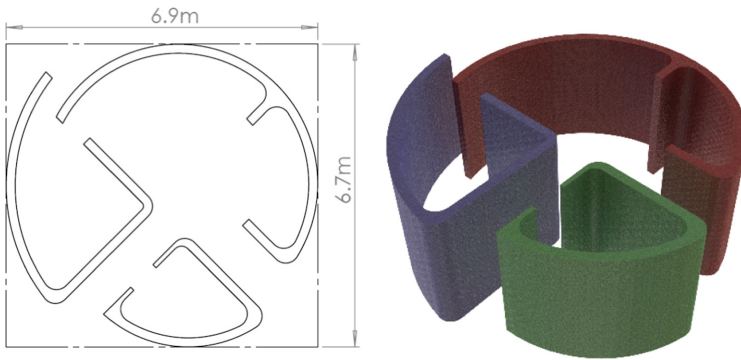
Floor plan of the printed house (a-left) and CAD model of the printed house (b-right).
